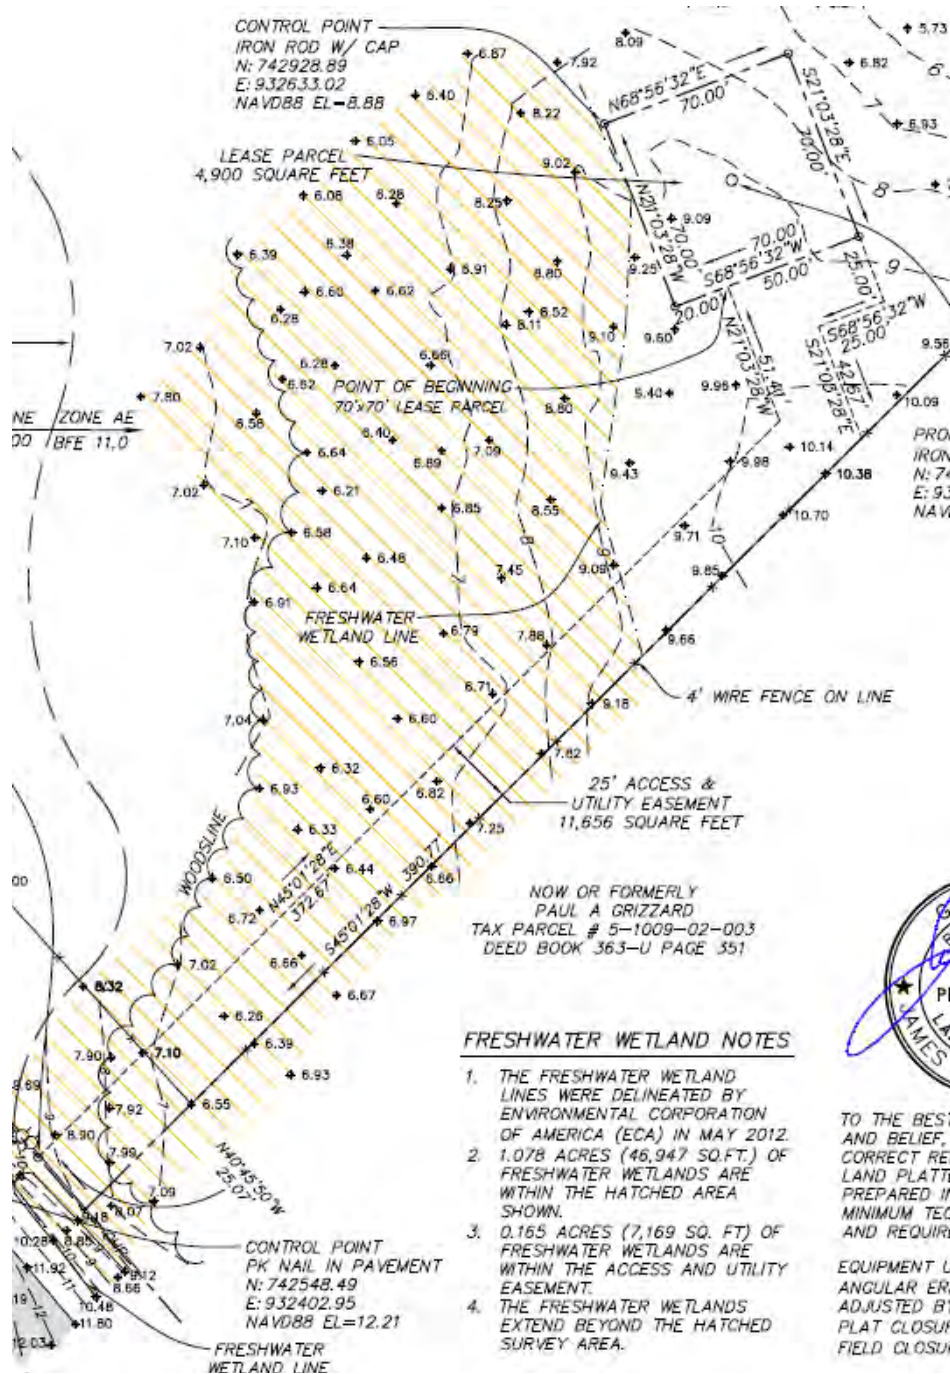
Case Study 5 Proposed Construction Plans with Recommended Impact Area Adjustments
